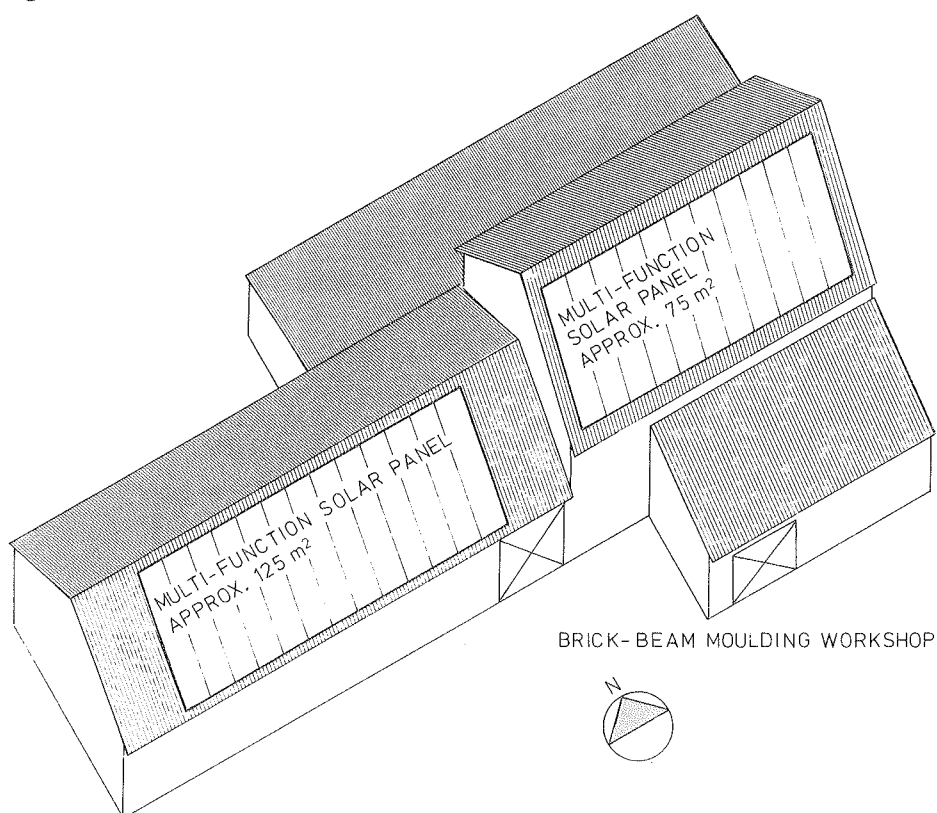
The workshop for manufacturing brick-beams with the MF-panels on the roof.
